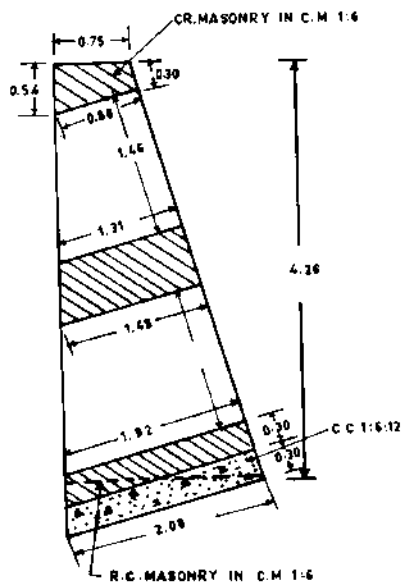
Typical cross-section of retaining wall (Dimensions in mm)
